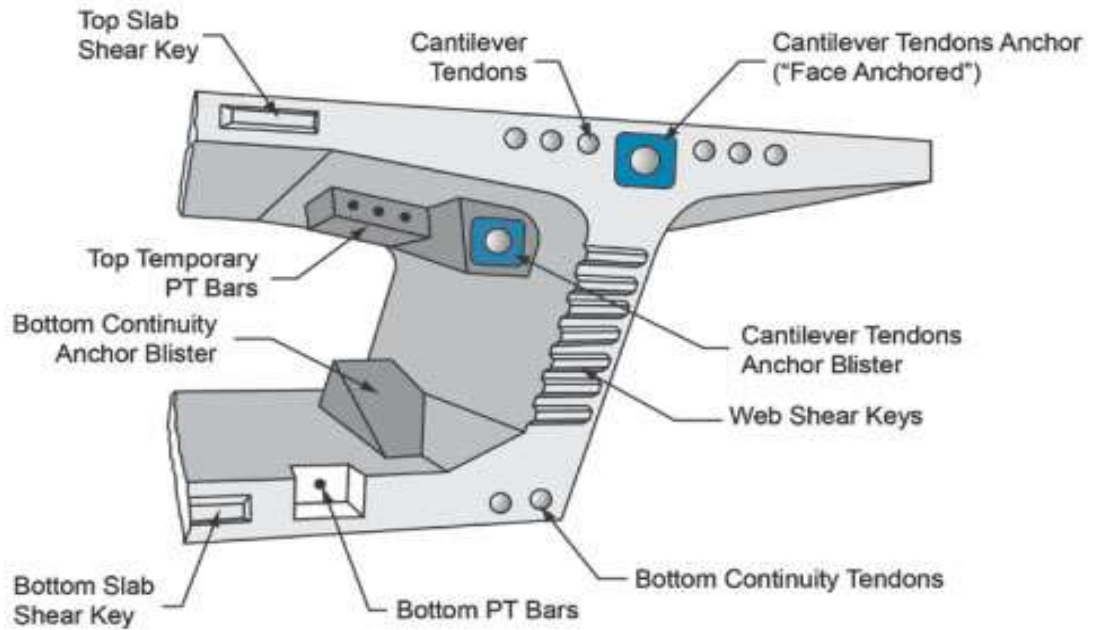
Cross section of a typical balanced post-tensioned beam (Source: Barry, 1996)
